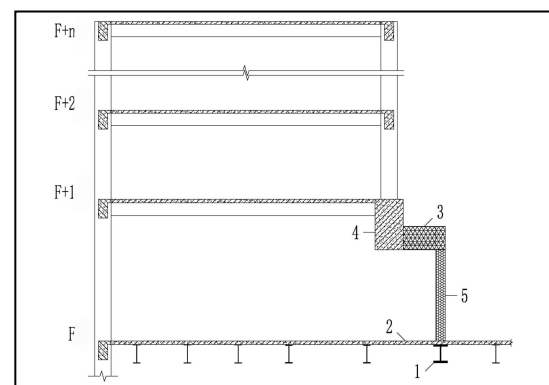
Framed Column Reverse Construction Section View (Section A-A)
